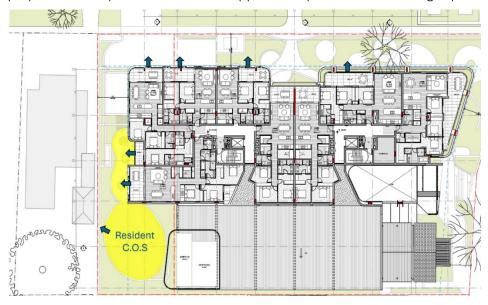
Potential opportunities for overlooking Source: Plus, Planning&Co
